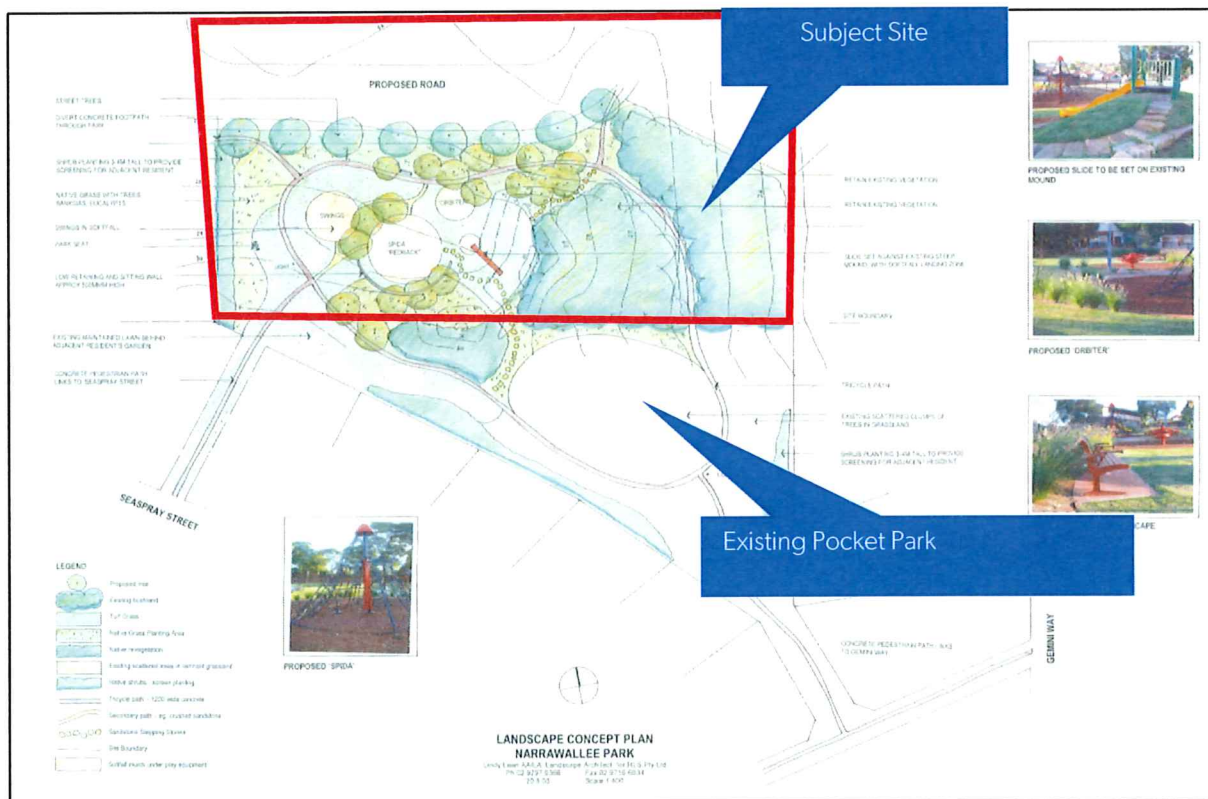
| New Children's Play Equipment Required Under Existing Project Approval
